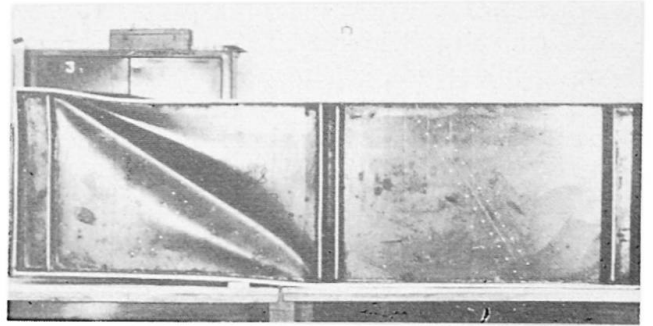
GIRDER TG5 AFTER TEST TO FAILURE
